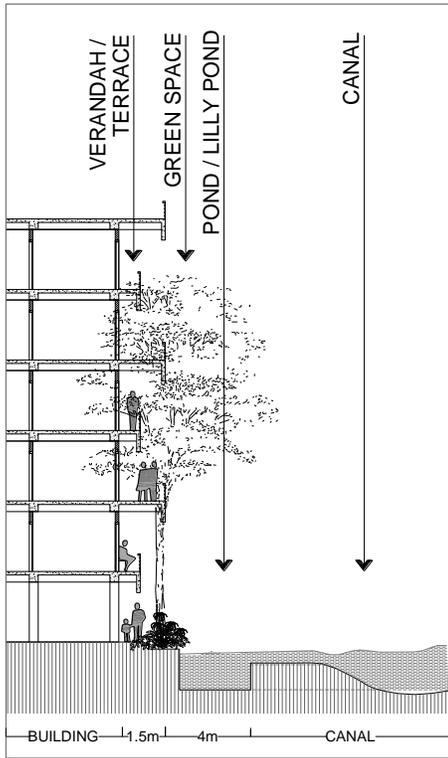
Typical residential building section with landscape feature and/or pond at existing 4m setback along canal
